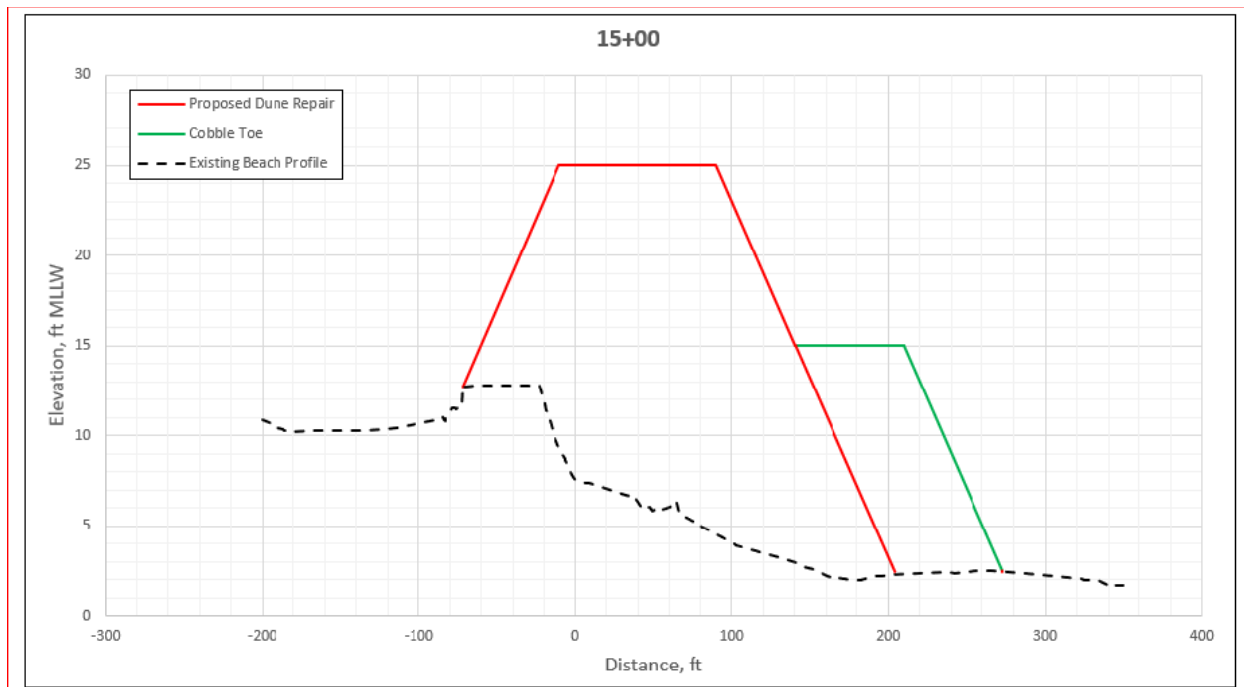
, Proposed cross-section of the repair in planning for the Empire Spit Repair. (USACE, 2022)
